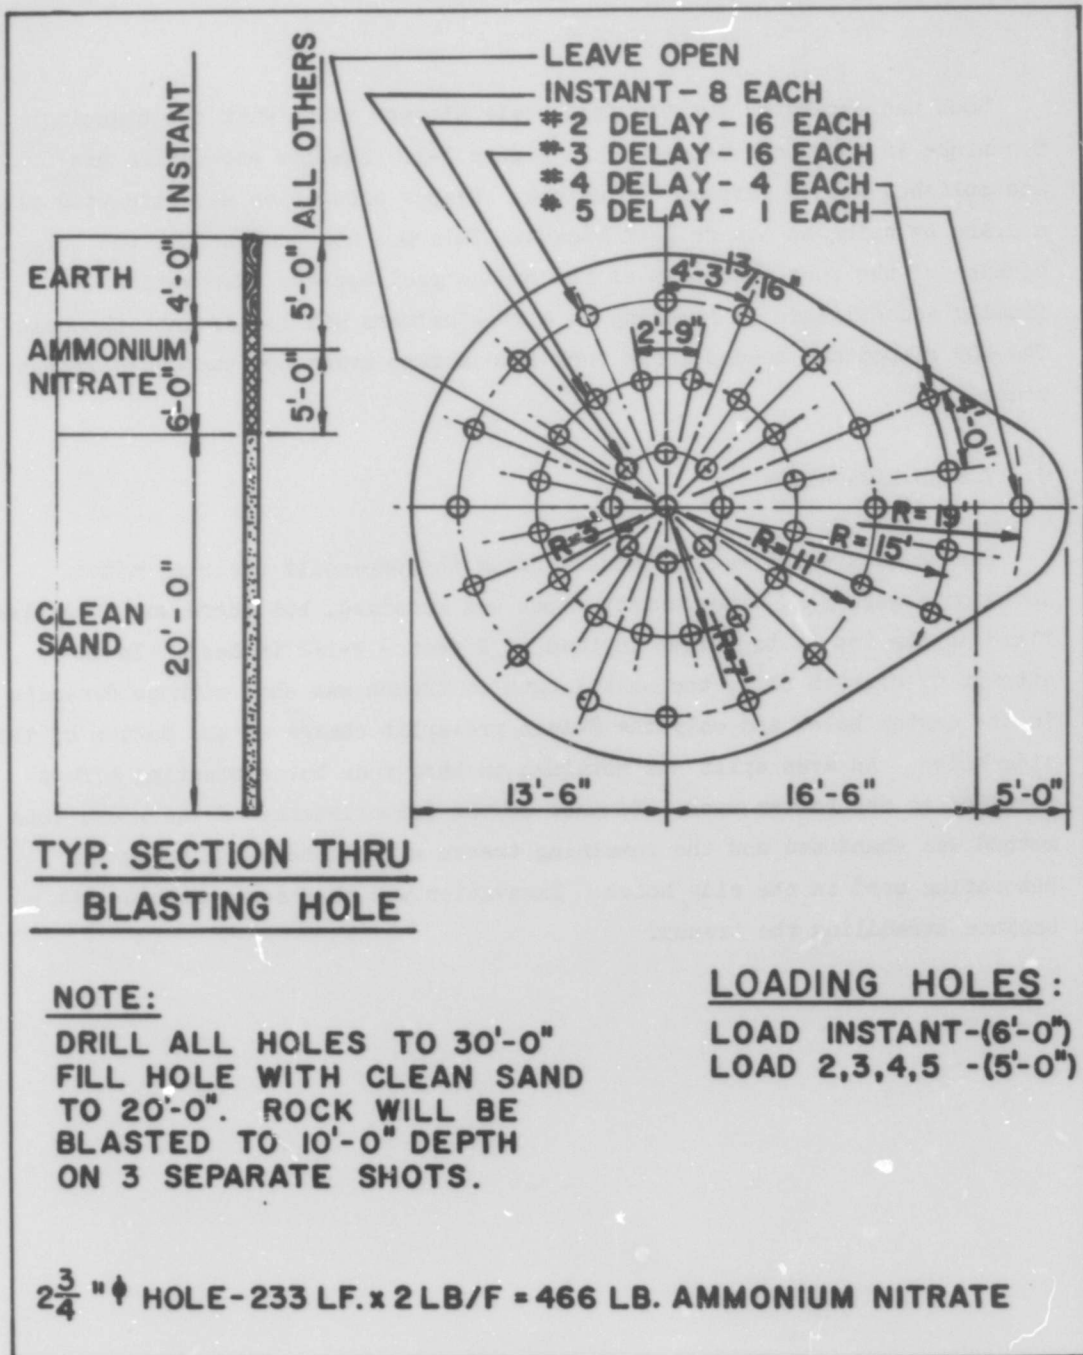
ROCKTEST 1 - Excavating and Blasting Plan for Full Scale Model.
